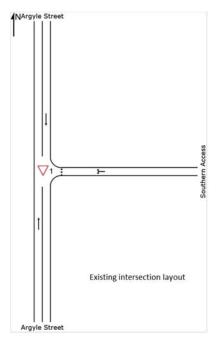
Southern Access and Argyle Street Intersection – Existing Layout
